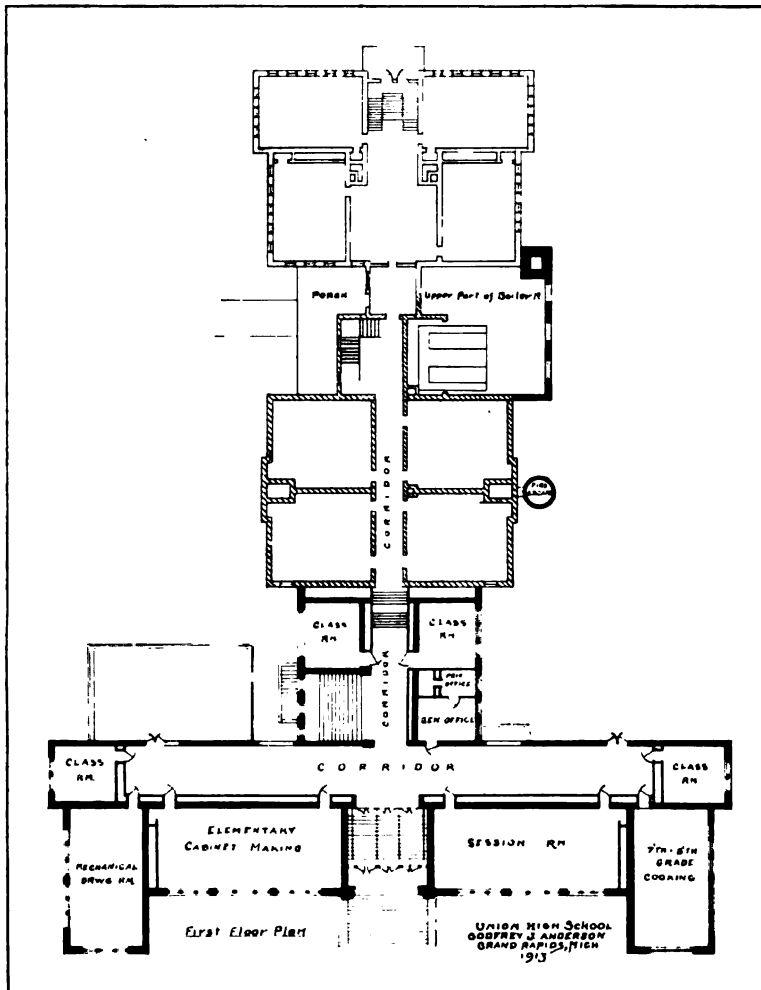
FIRST FLOOR PLAN, UNION HIGH SCHOOL, GRAND RAPIDS, MICHIGAN.
